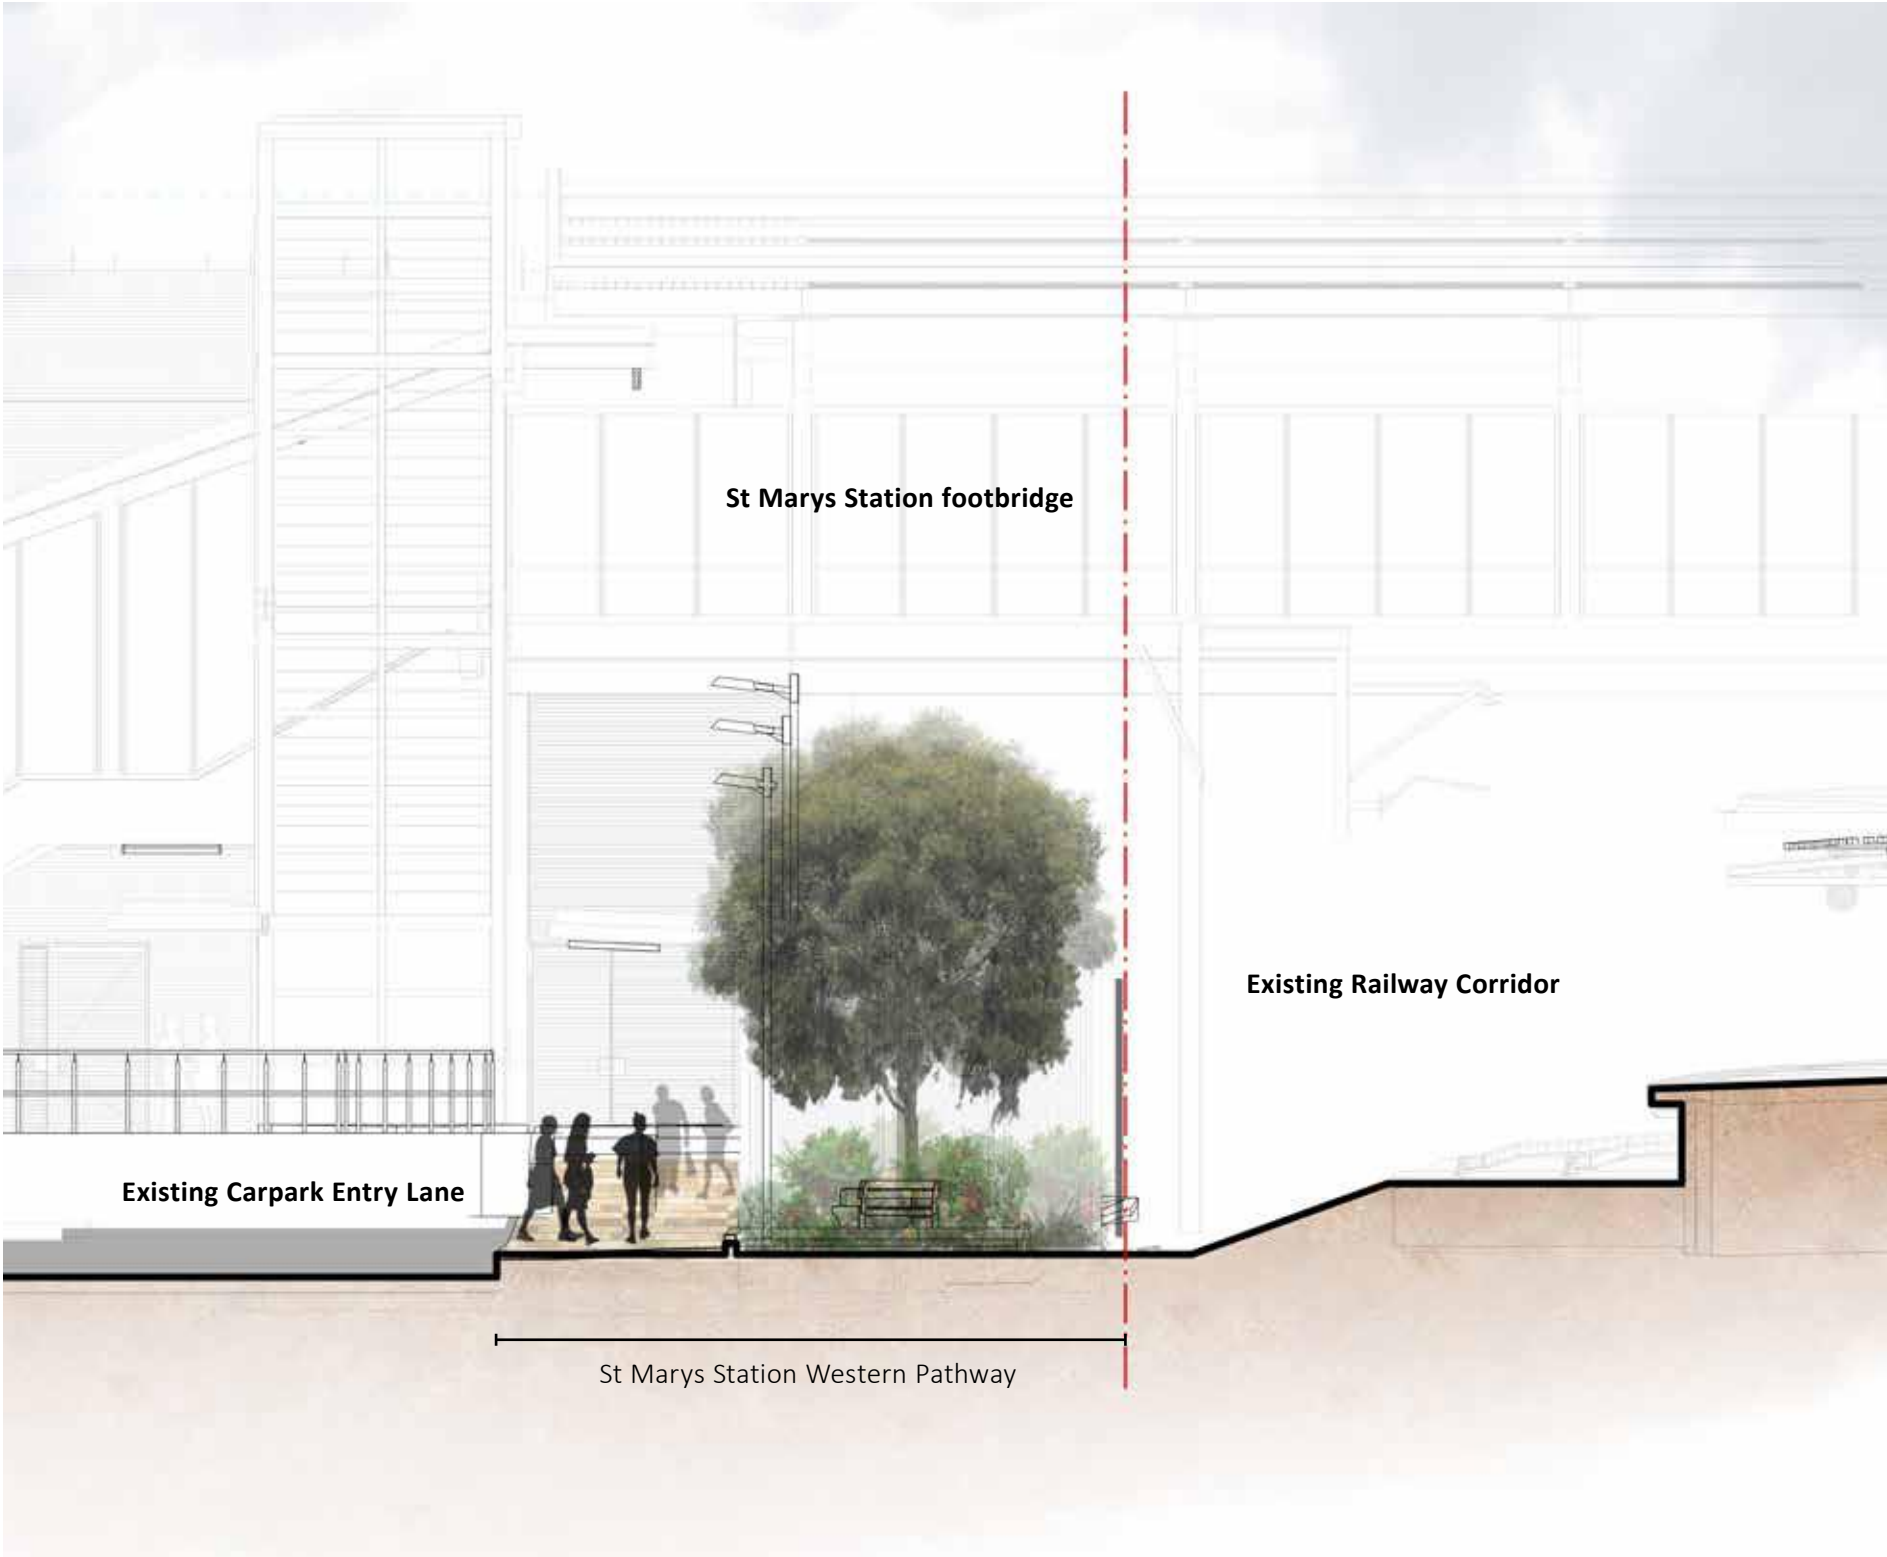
Section C, north south section through western pathway, looking east towards the new footbridge
